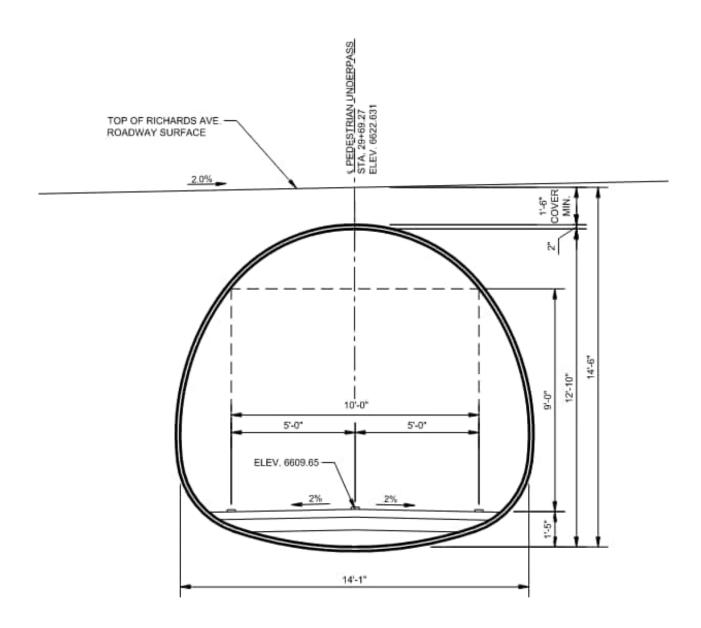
Alternative 1 - Structural Steel Plate Typical Section
